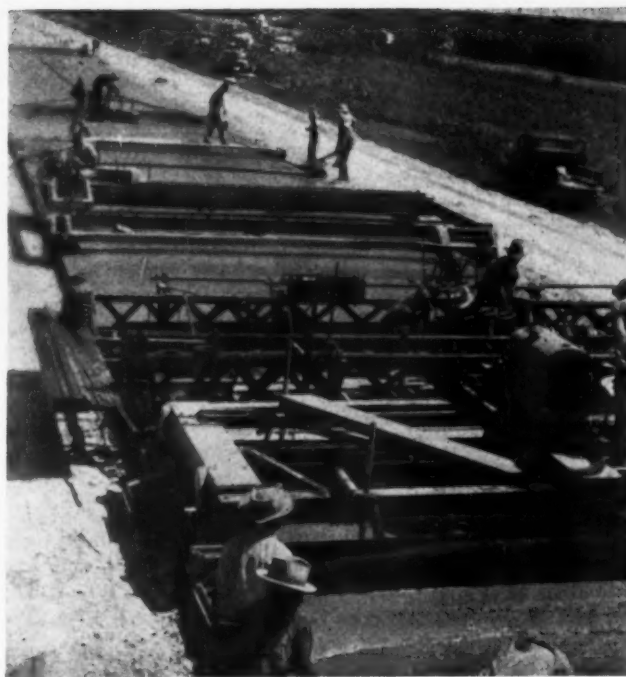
Finishing Machine, Flexplane Joint Machine, Longitudinal Finisher, Hand Finisher, and Center Stripe Machine Compactly Organized
